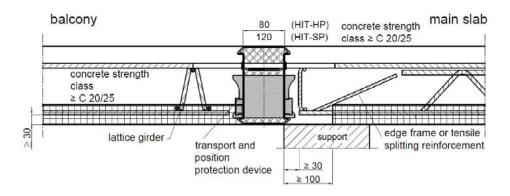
Example of the connection HIT-HP/SP MVX to element slabs with statically effective in-situ layer
